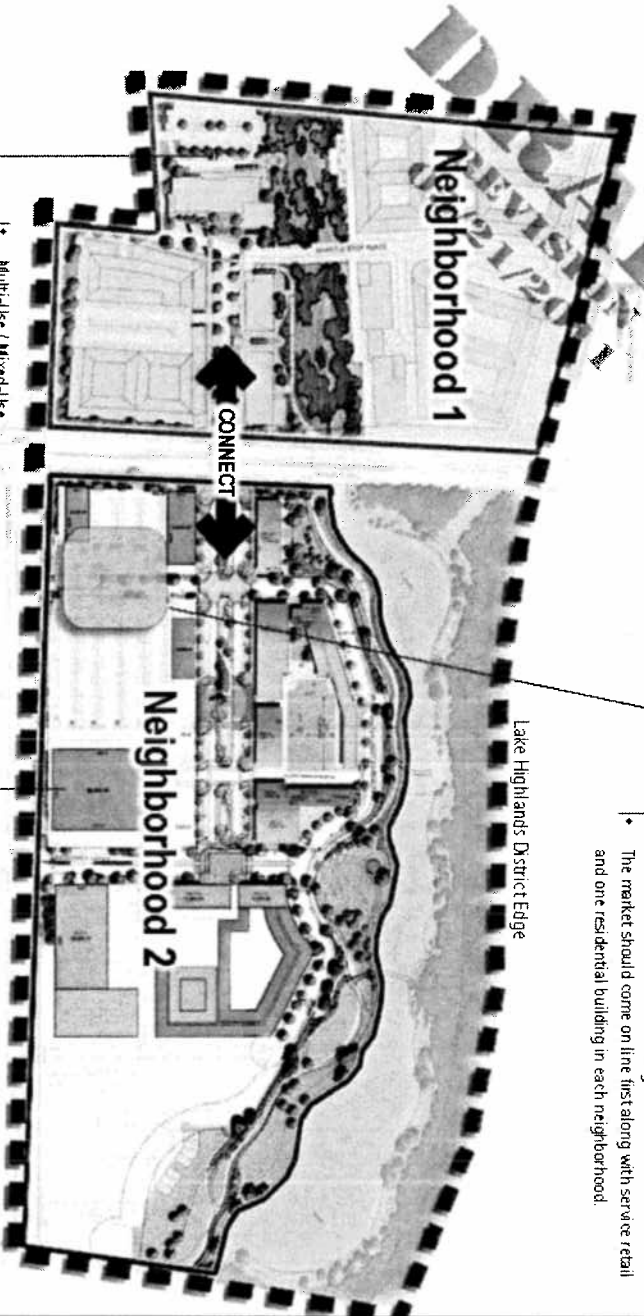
Exhibit B Lake Highlands Town Center (LHTC) Conceptual Site Plan
